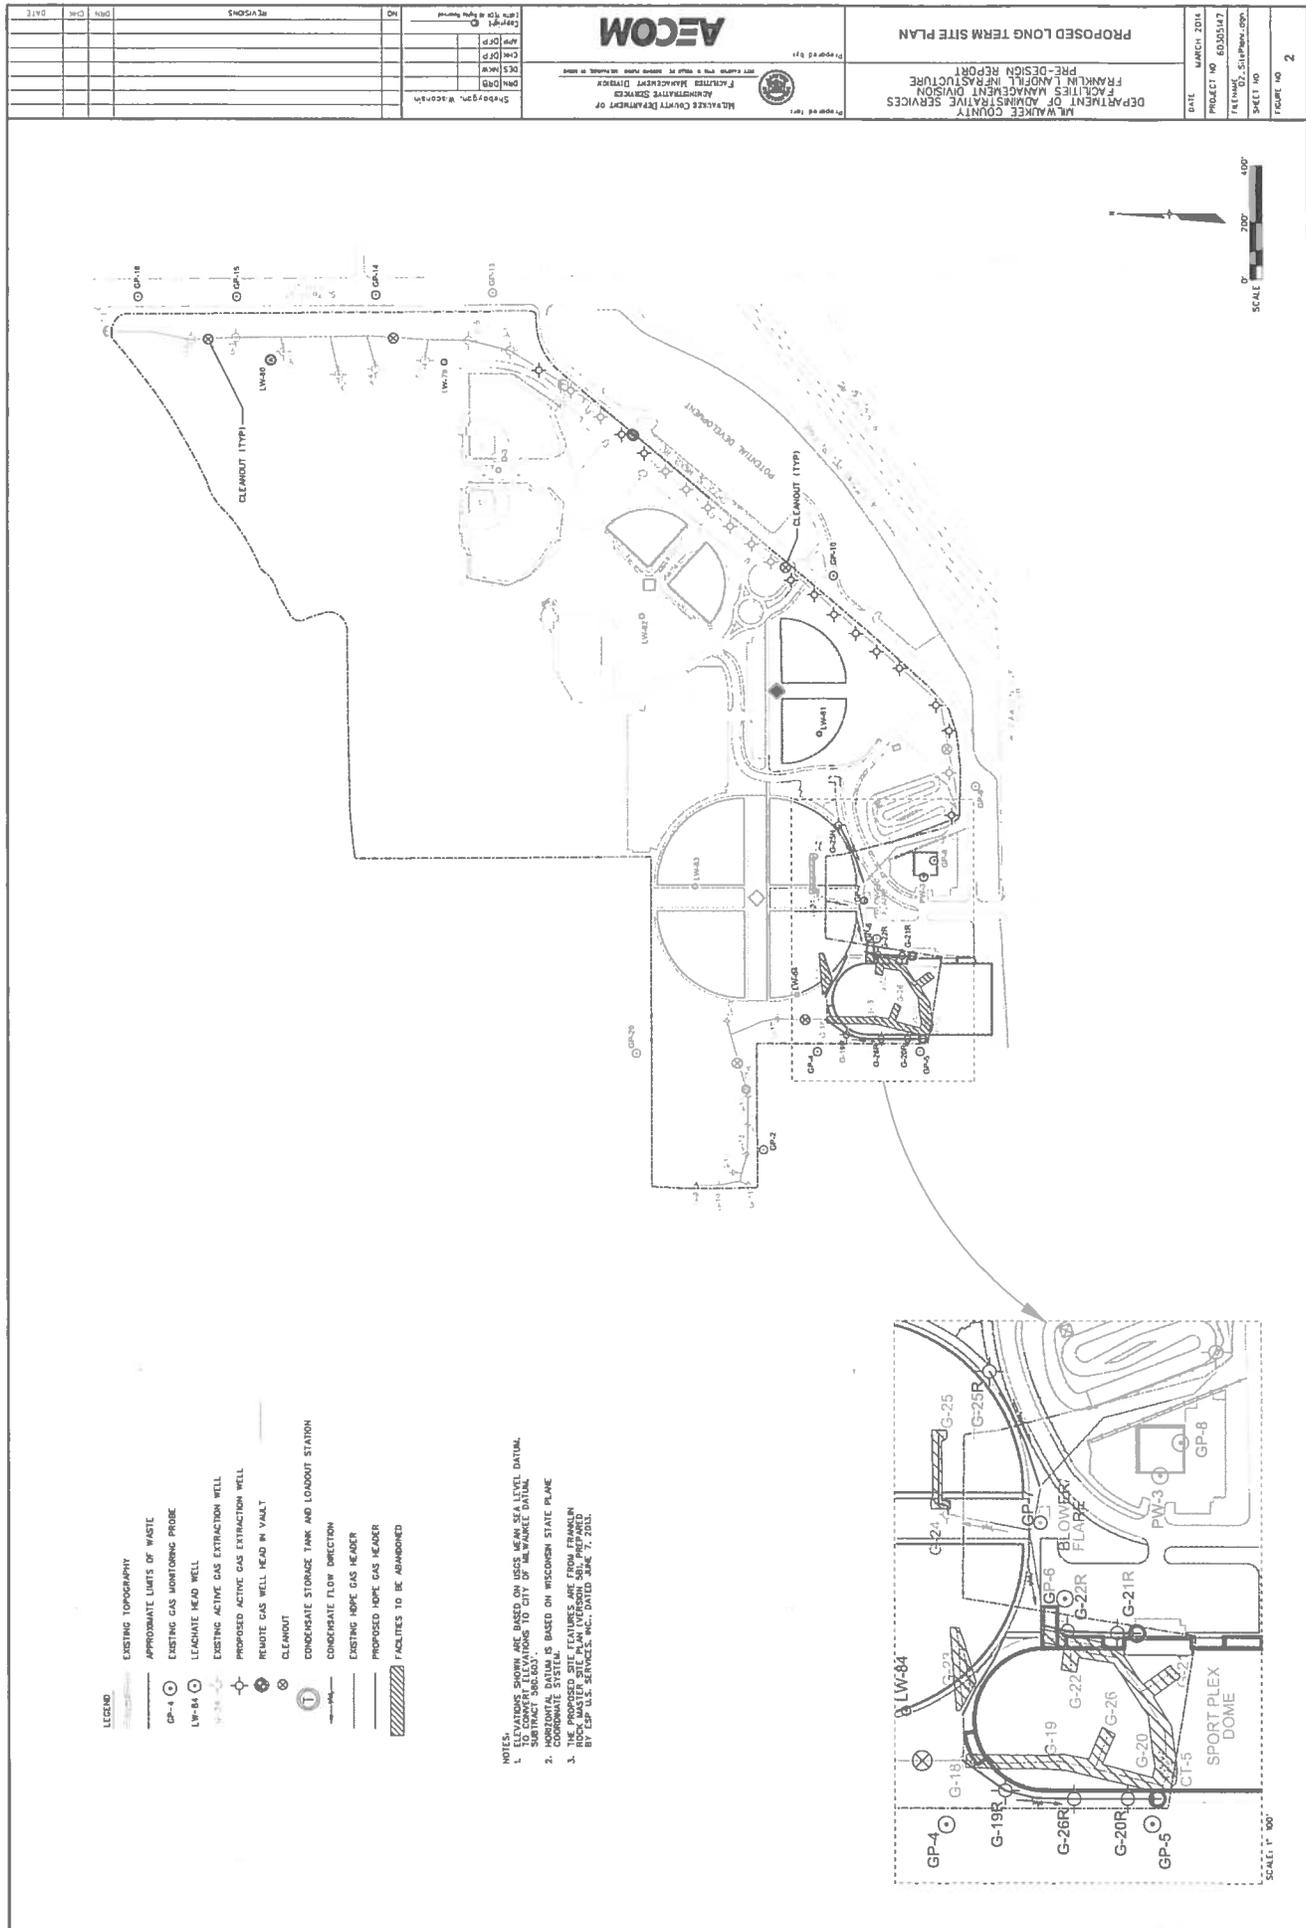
Conceptual Plan for Additional Wells (AECOM)
